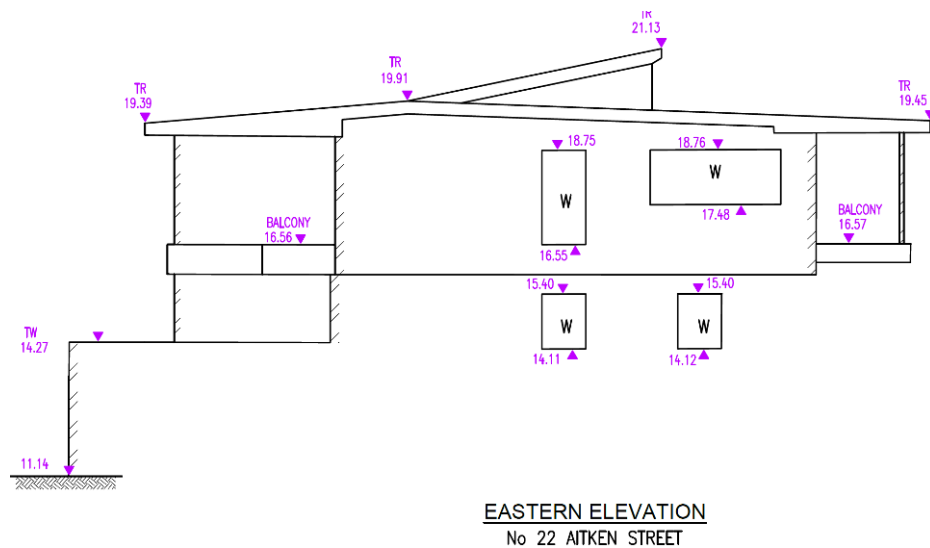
window openings and front balconies within the east side elevation of the adjacent development at 22 Aitken Avenue
